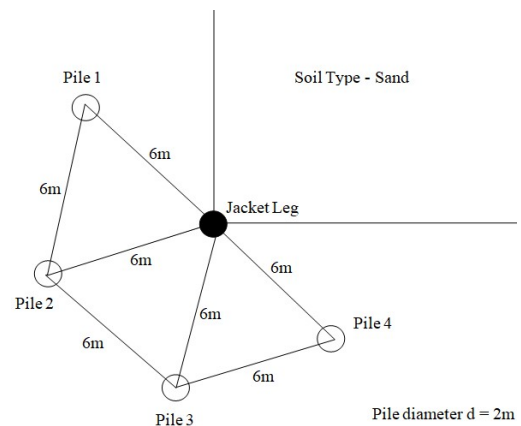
Plan view of skirt piles configuration at base of jacket structure in medium dense sand
